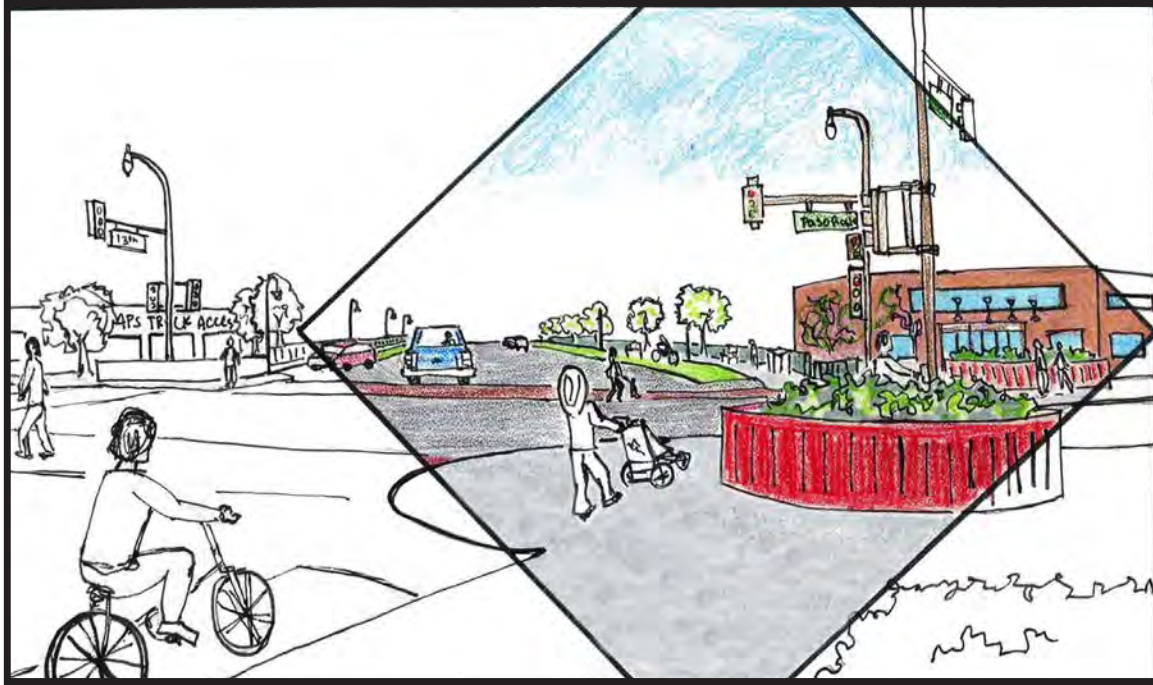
A conceptual drawing of the 13th Street and Paso Robles Street intersection.
